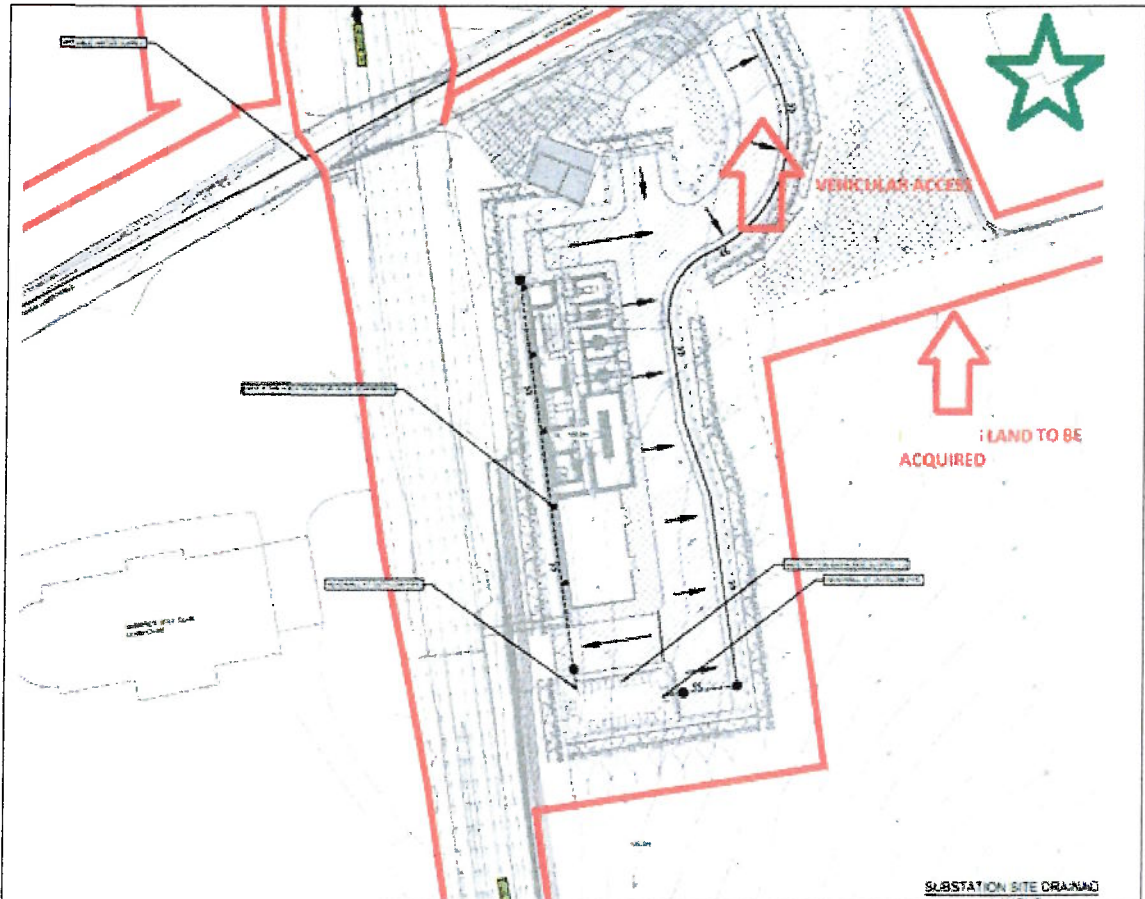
Layout of the proposed Substation which is to be constructed on lands which are subject to the CPO element of the Railway Order. Layout extracted from drawing no. D+WP56-ARP-P4-NL-DR-RO-000813 in the Specific Location 08 Booklet of drawings submitted as part of the application. It is evident from the drawing that a vehicular access point is proposed directly from the lands to the Golf Links Road. It is unclear therefore why a right of way, which will run behind and may interfere with access from the house (green star) to the field to the rear of the adjoining house is necessary or proportionate having regard to constitution protections afforded to private property rights.
